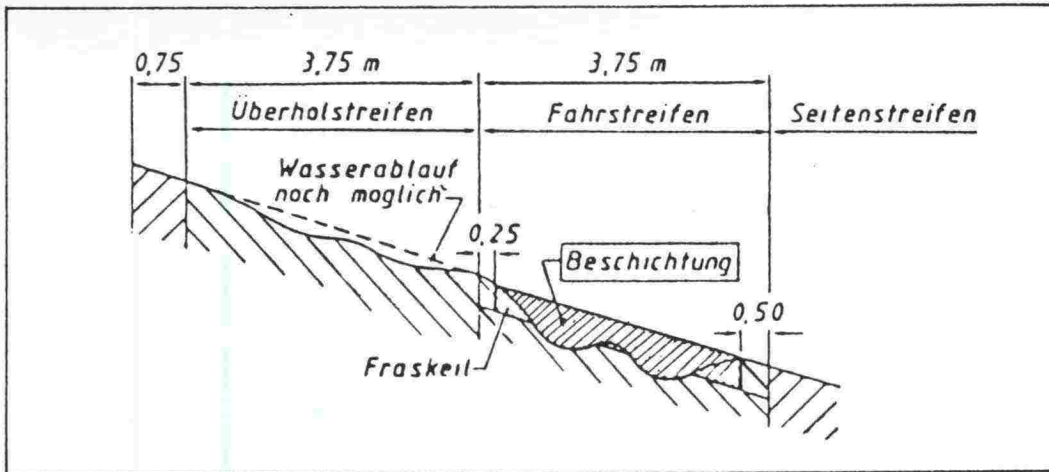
Repair of ruts with concrete mix according to an Austrian research /36/
